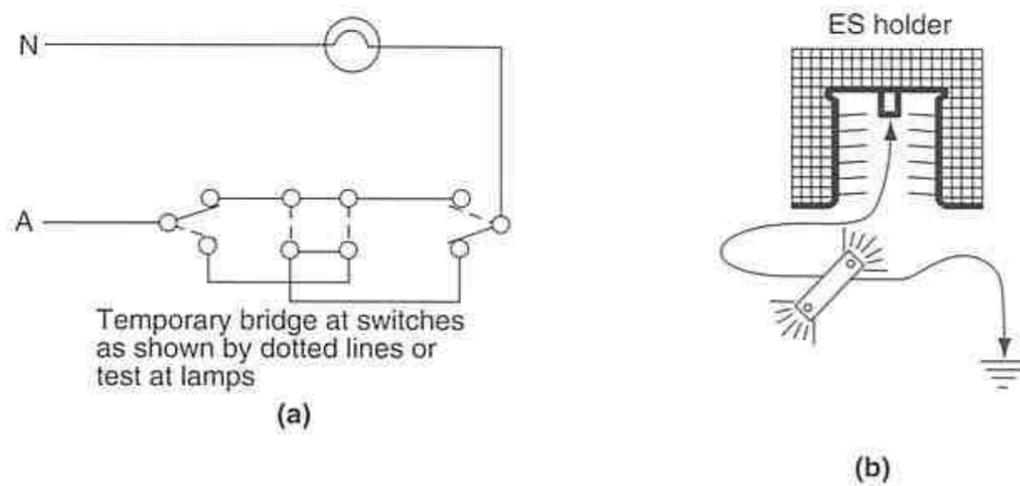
Polarity testing multiposition controlled lighting and Edison screw (ES) lampholders
